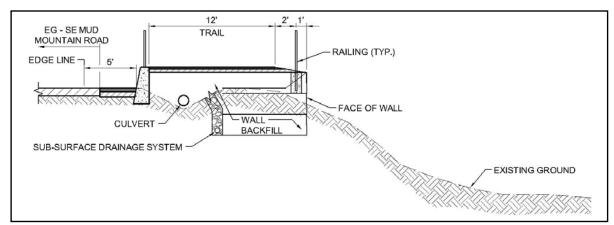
Section A Sub-Option - Trail with Culvert South of SE Mud Mountain Road
